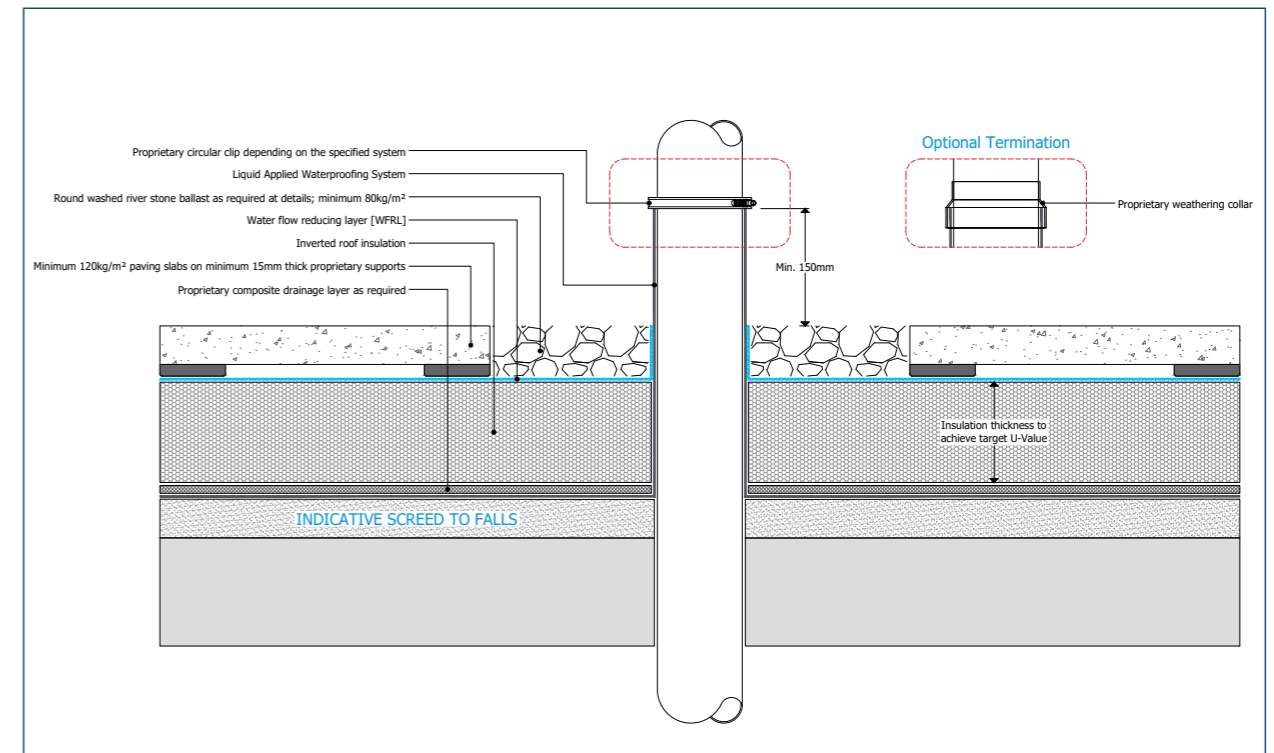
Inverted Roof - Typical Pipe Penetration
